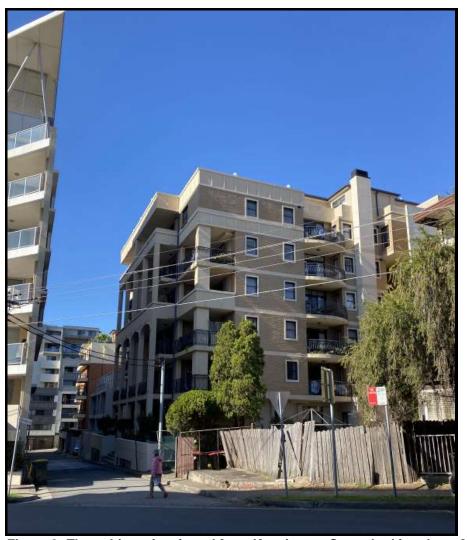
The subject site viewed from Kensington Street looking down Moorefield Lane
